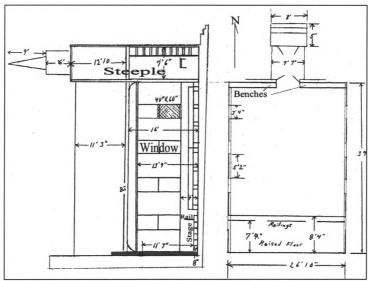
Elevation sketch (left side) and core floor plan (plan drawing by Floyd Soenksen)<sup>1</sup>
